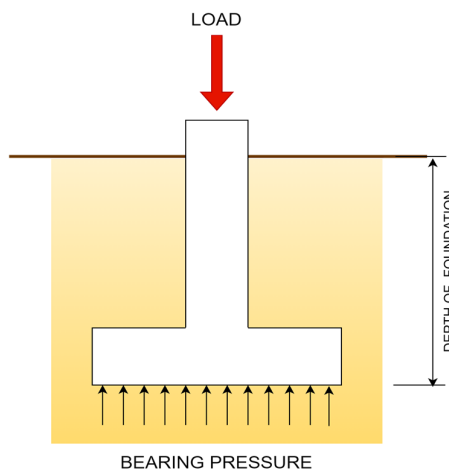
Shallow foundation (Source: Project Lead the Way, PLTW)
